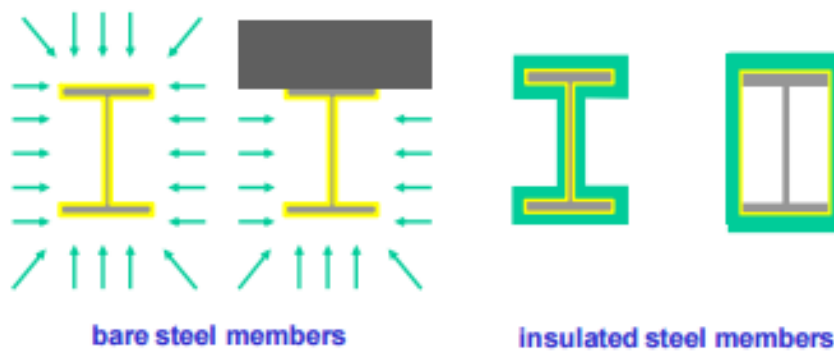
Perimeter of unprotected steel cross-sections. [3]
